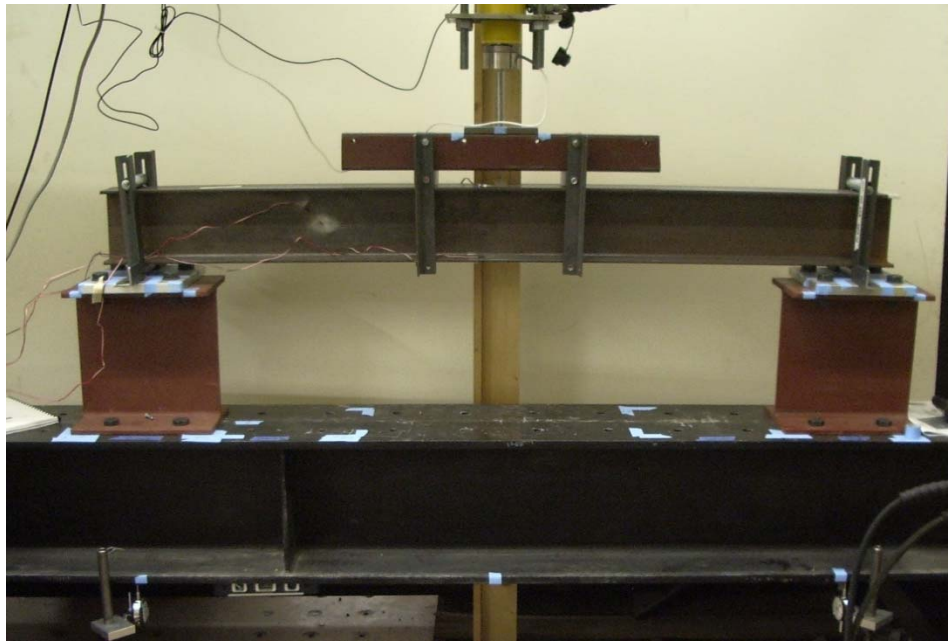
Preliminary load testing of control steel beam (SBC) [63].
